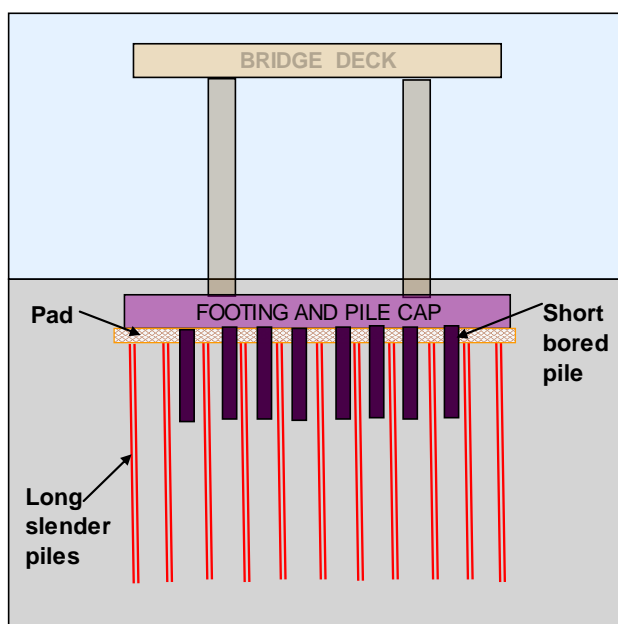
Piled pad foundations for the Golden Ears Bridge piers.
